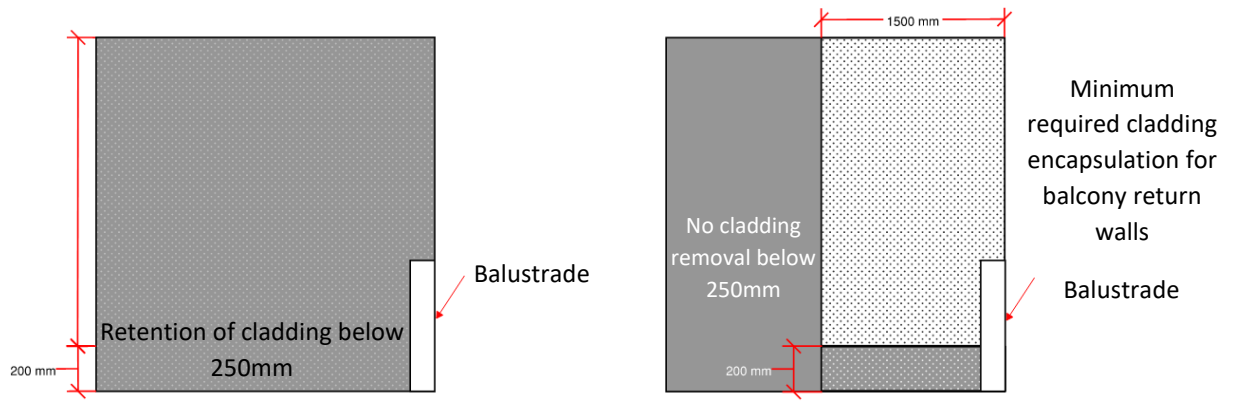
Elevation of balcony return wall cladding encapsulation (left) and cladding removal (right)
